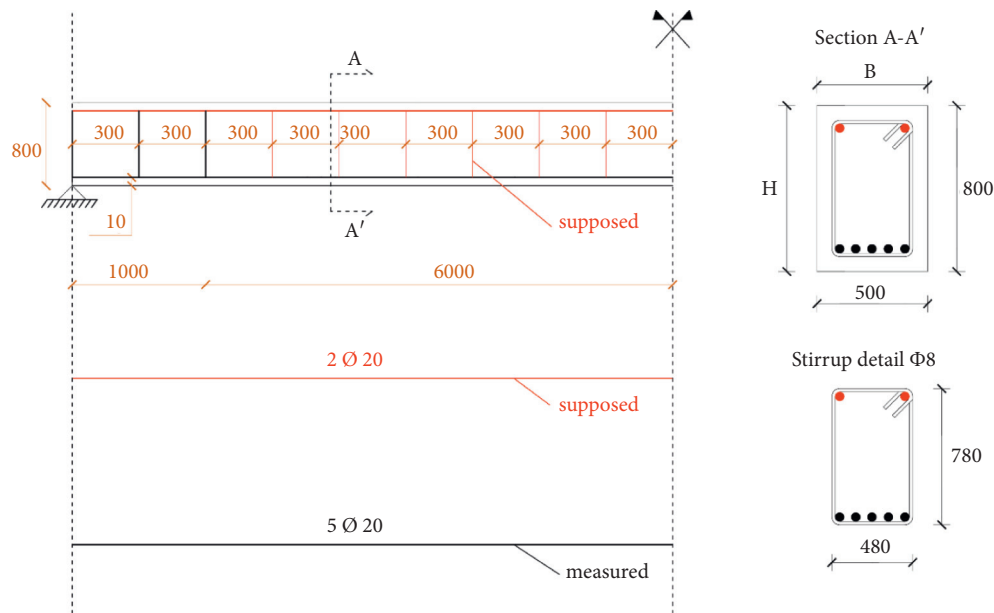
Identification of internal reinforcing bars of the very long span beam: cross section (a) and longitudinal section (b).
